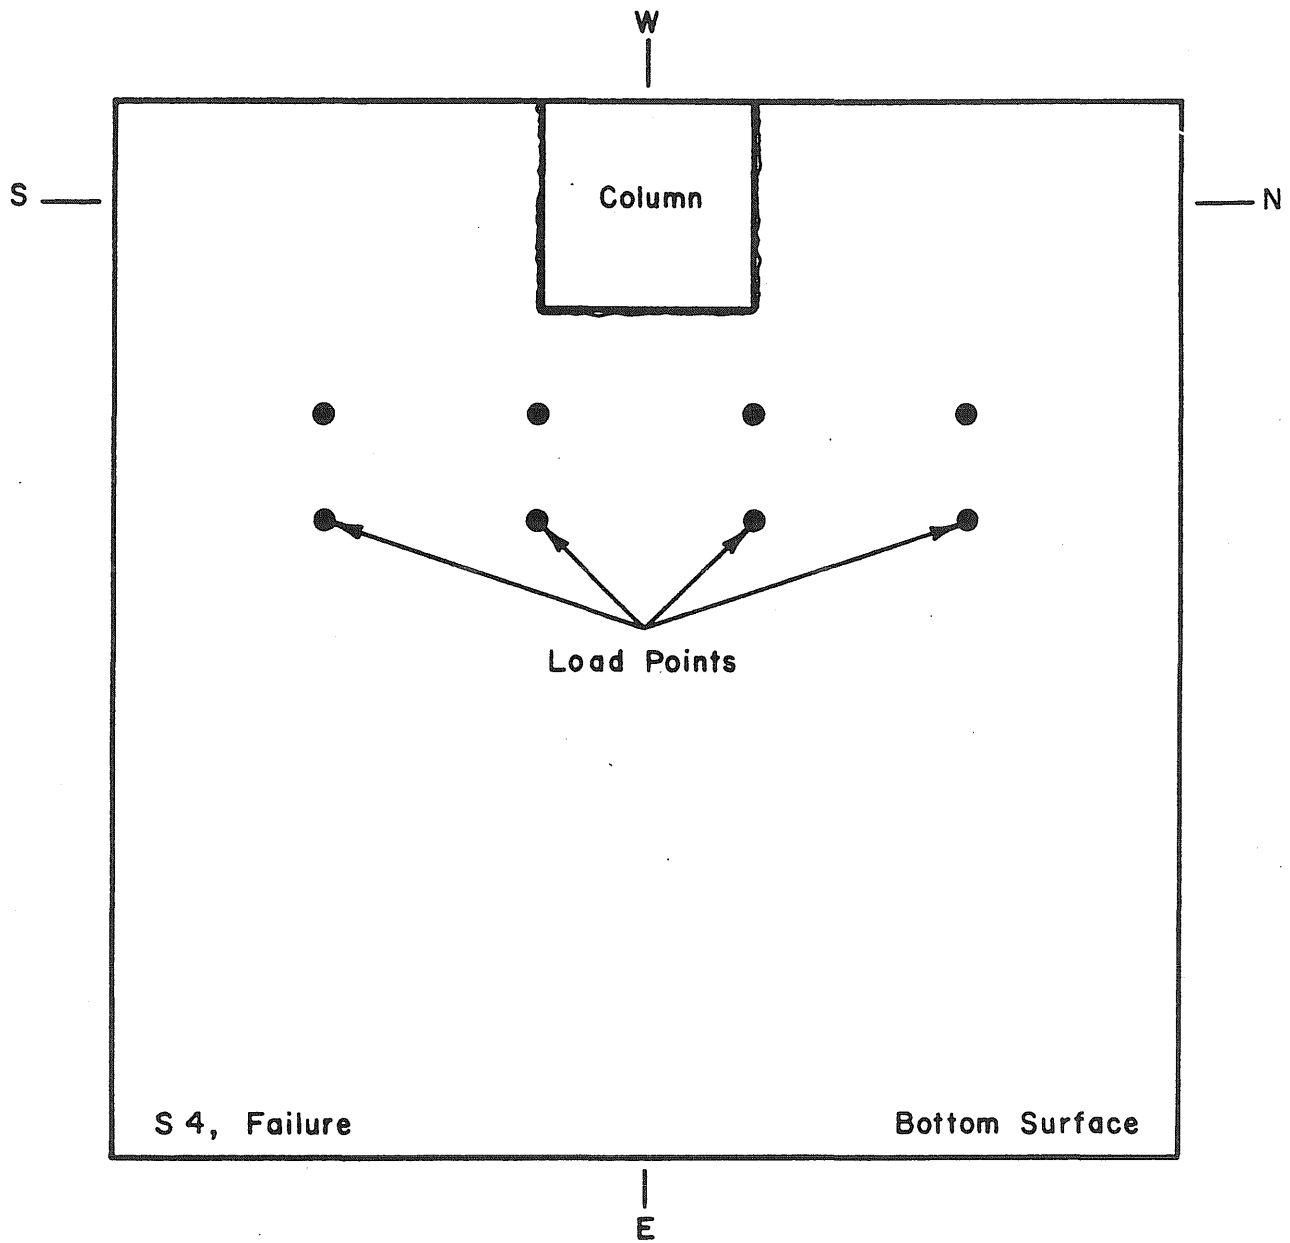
Crack Pattern at Failure on the Bottom Surface of Specimen S4
